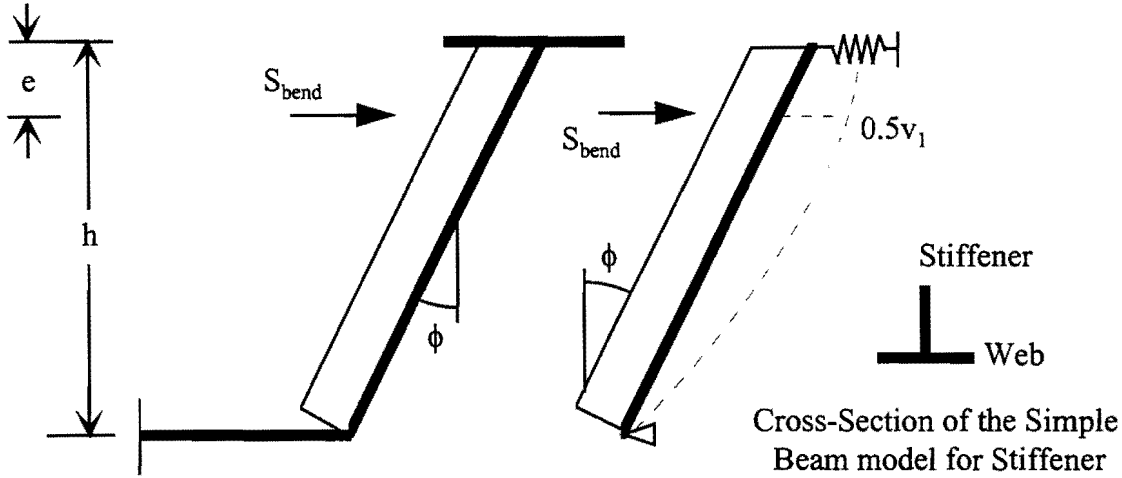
Simple Beam Model for Stiffeners in Girders with SD-type Truss
